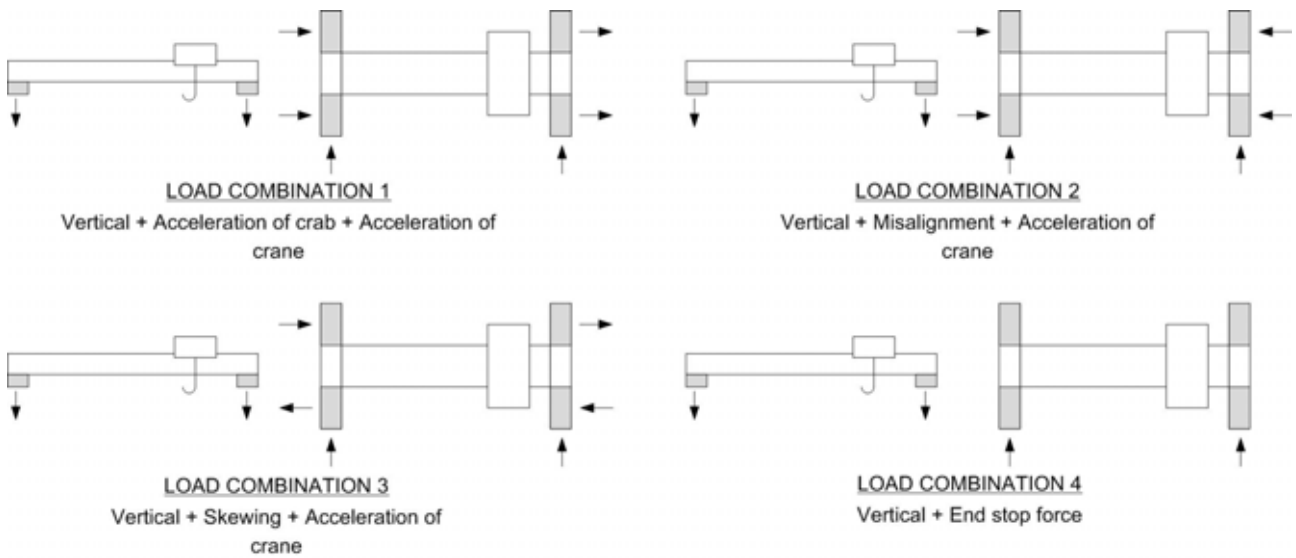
Crane load combinations used to analyse the structure and runway girders. [Dymond 2005]
